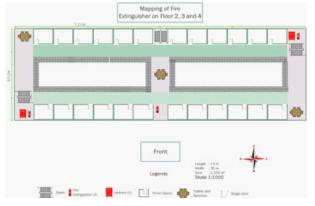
The Dormitory Building on Floor 2, 3, and 4 before Analysis was Conducted
